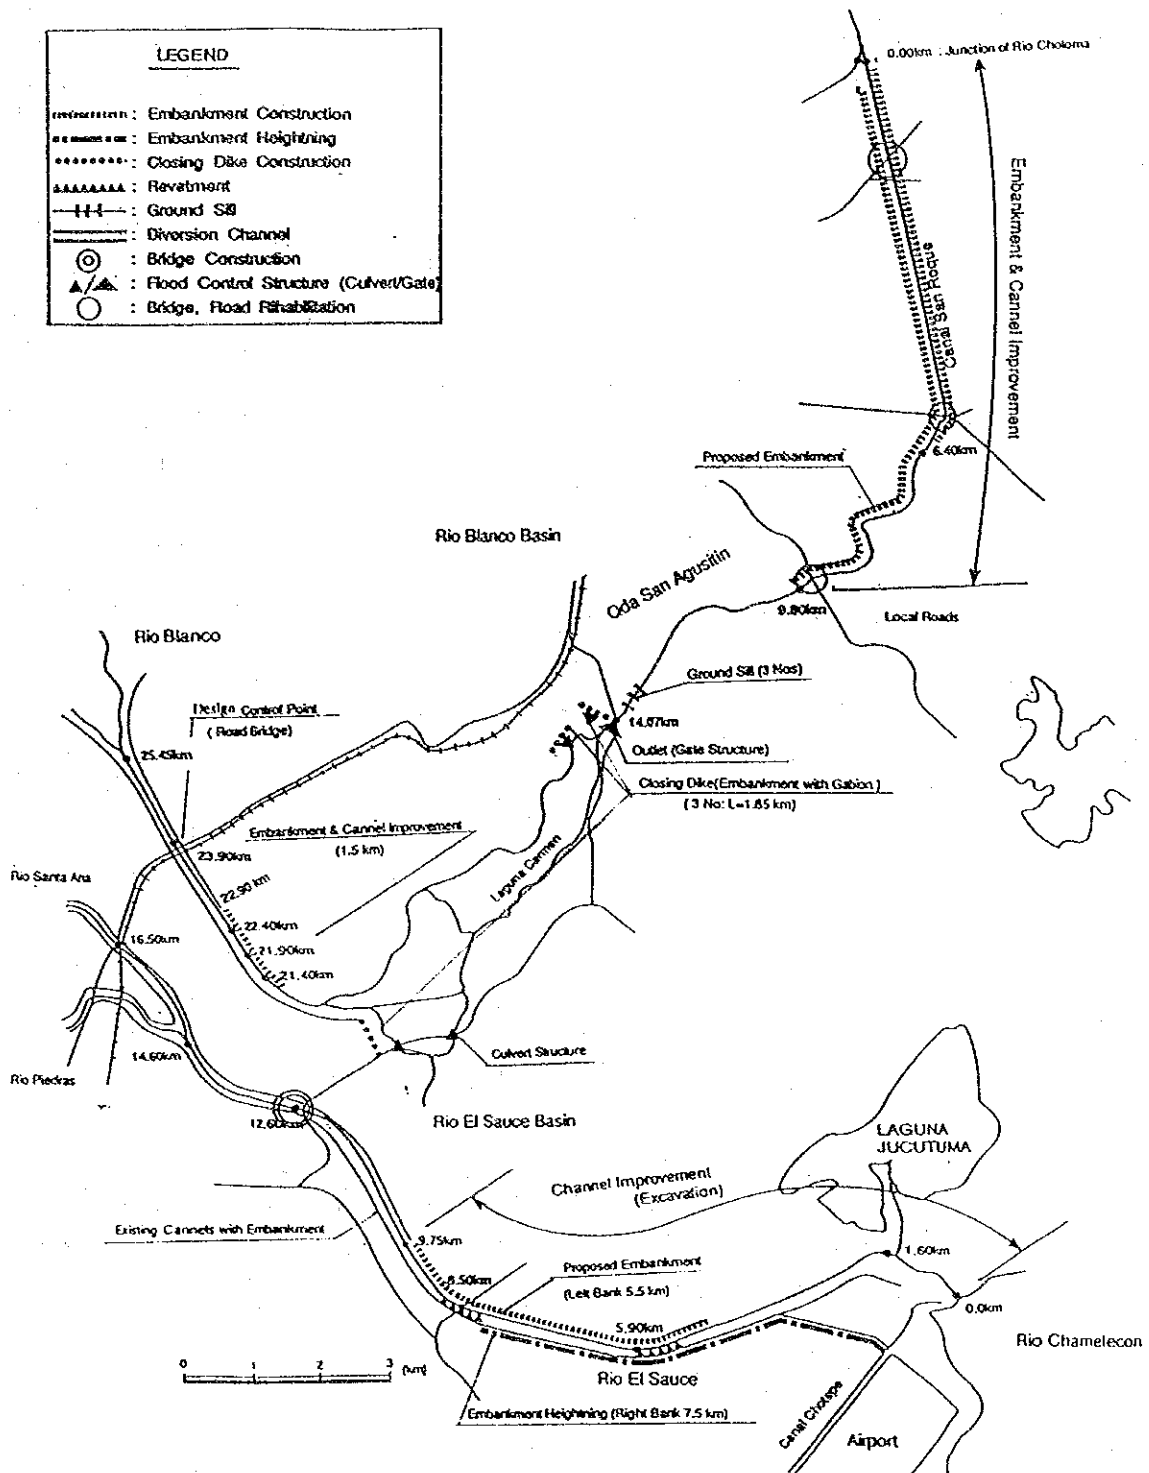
PROPOSED FLOOD MITIGATION FACILITIES OF THE RIO BLANCO AND EL SAUCE (ALTERNATIVE 1)
